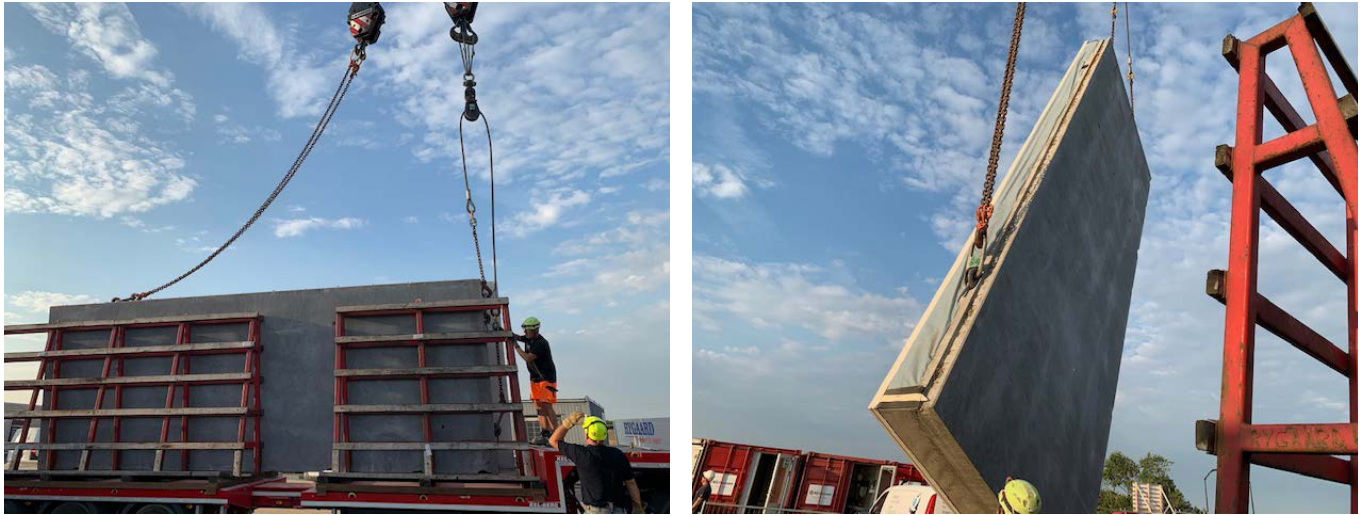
Precast wall element turned 90° into vertical position, site pictures.
